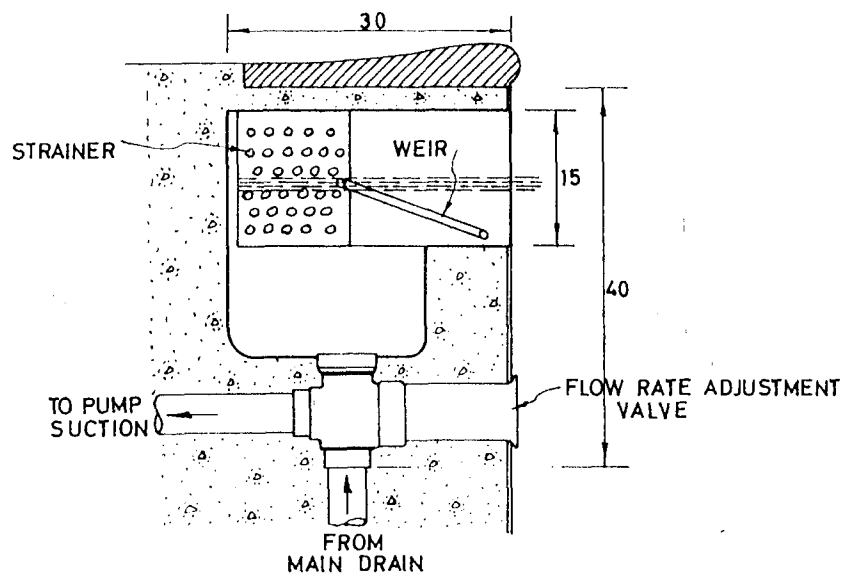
(b) TYPICAL SECTION THROUGH SURFACE SKIMMER
